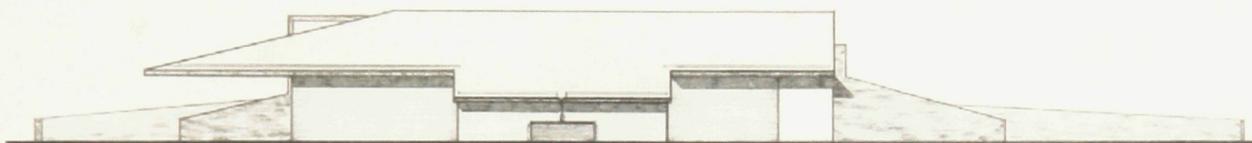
Pavilion: North Elevation*, graphite, original 8" x 25" @ 1:100, 2008. Created by author.
